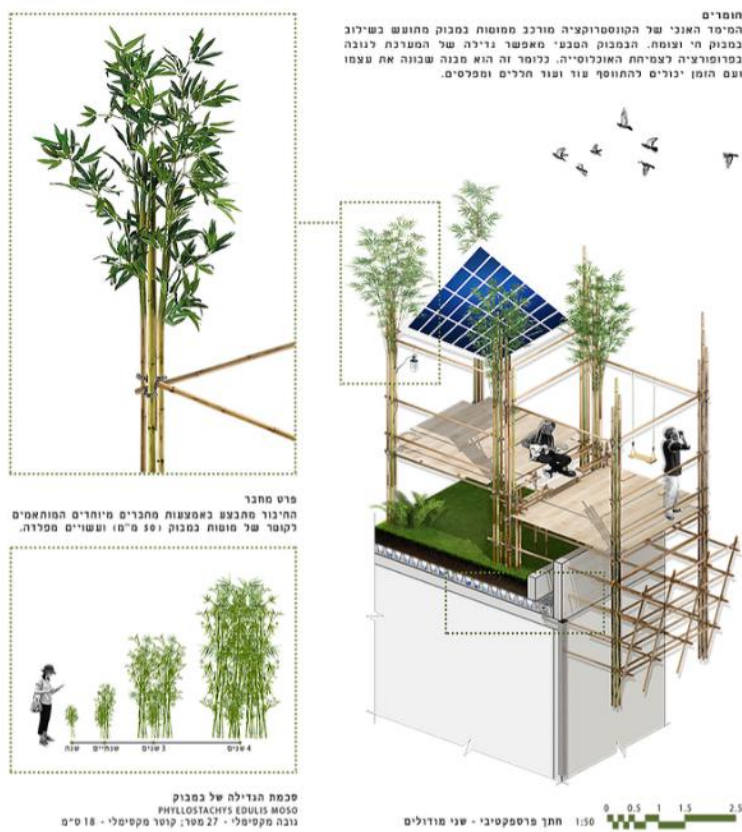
Renewable materials, planting and renewable energy on rooftop additions.
